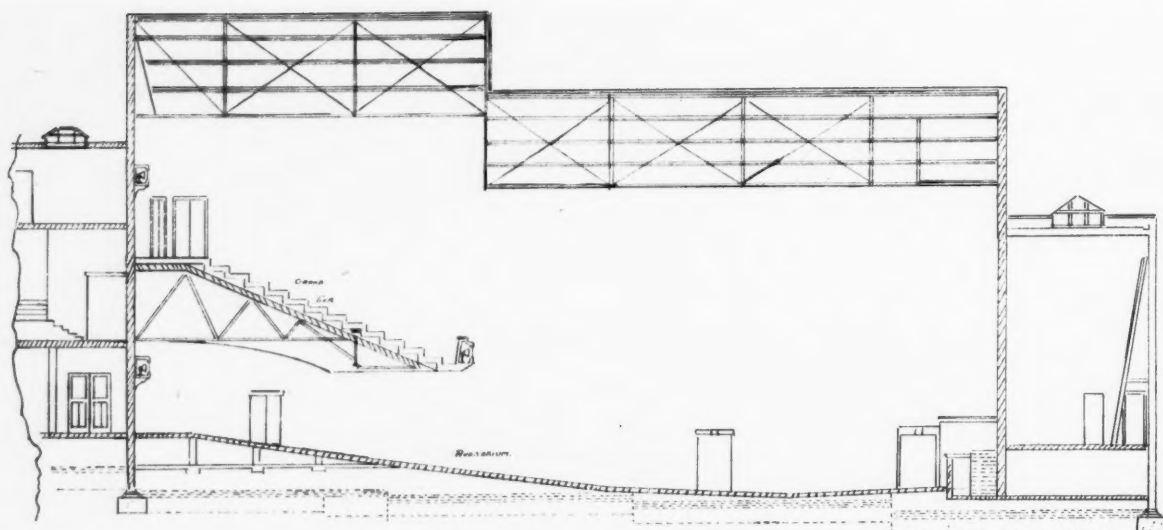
Sectional Elevation of Auditorium in the Majestic Theatre, Wembley.
